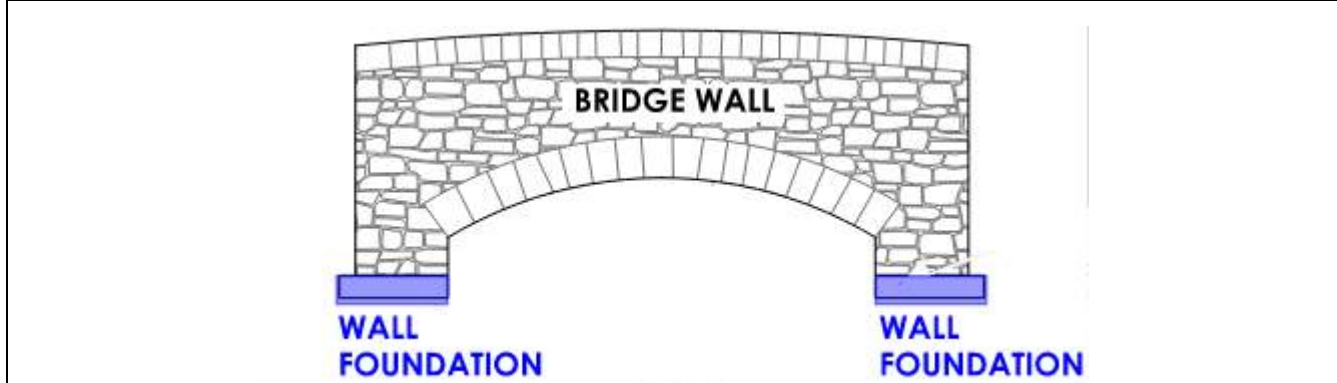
Elevation: Bridge Deck, Wall, Padstone and Foundation References
